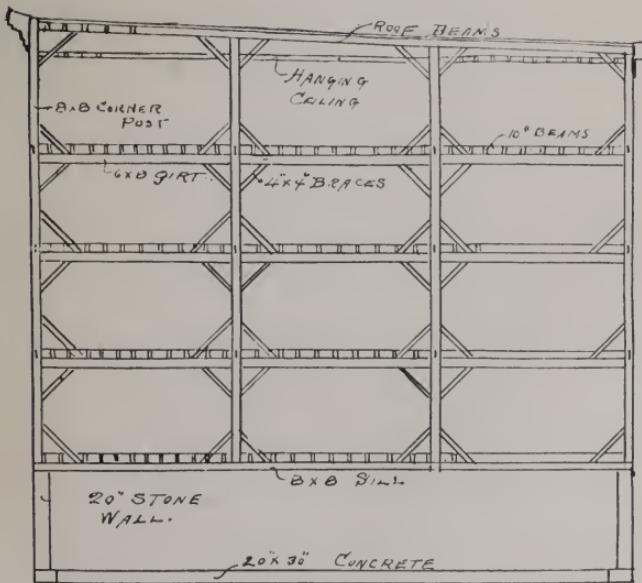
FRAMING OF GABLES AND PARTY WALLS.
